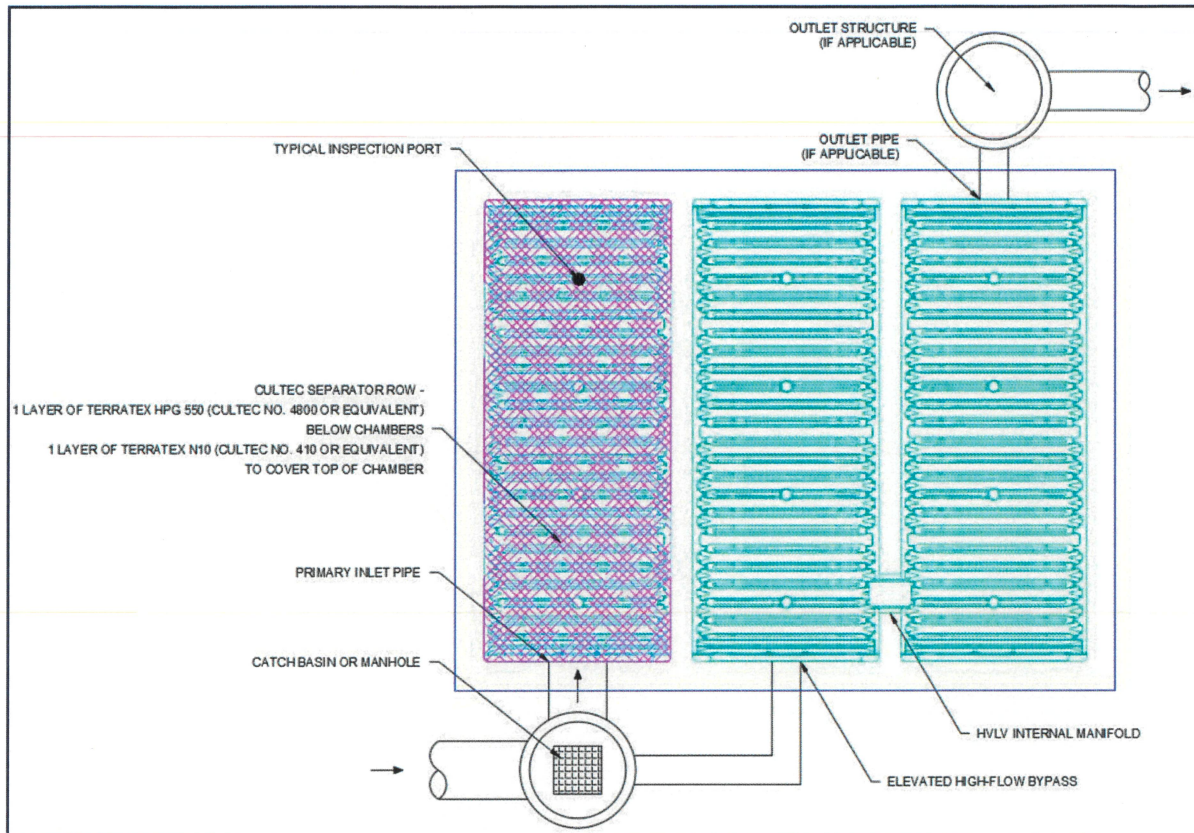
Cultec Separator Row™ Filtration System – Plan View
